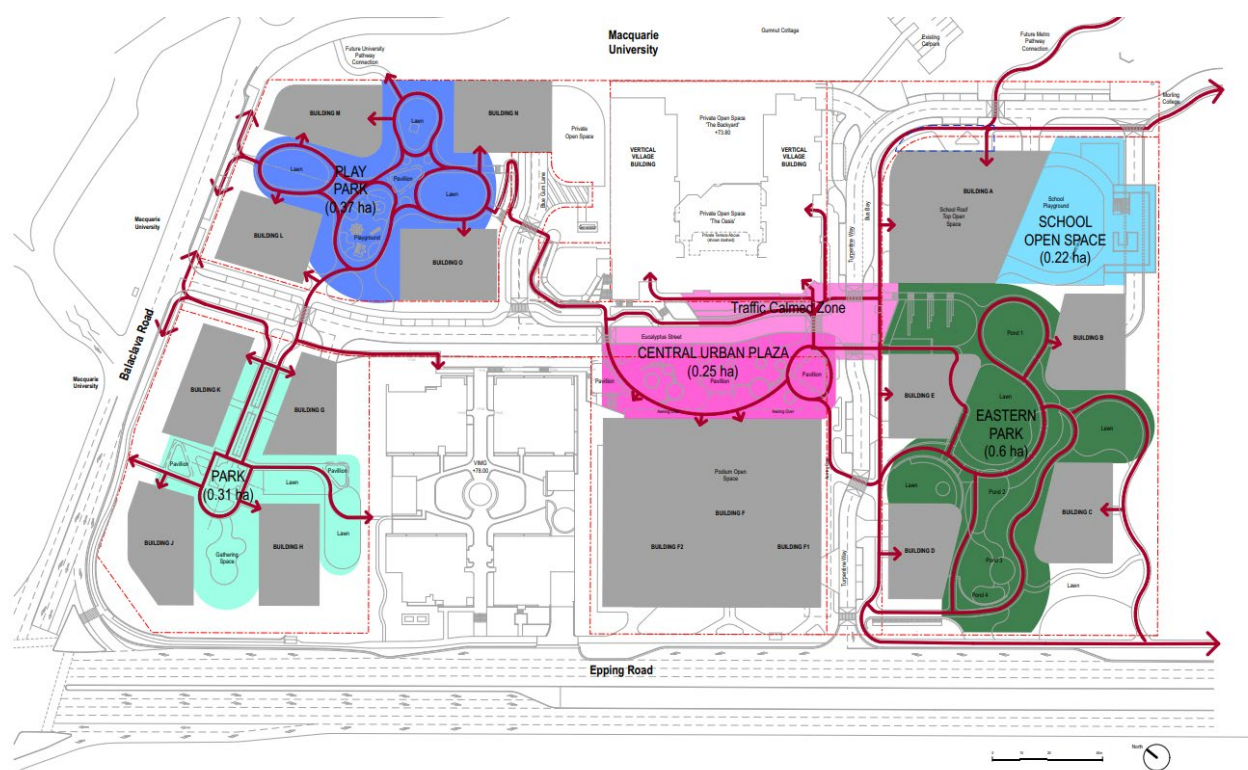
Diagram illustrating the primary open space and parkland areas created as part of the Landscape Design and Conceptual Master Plan layout
